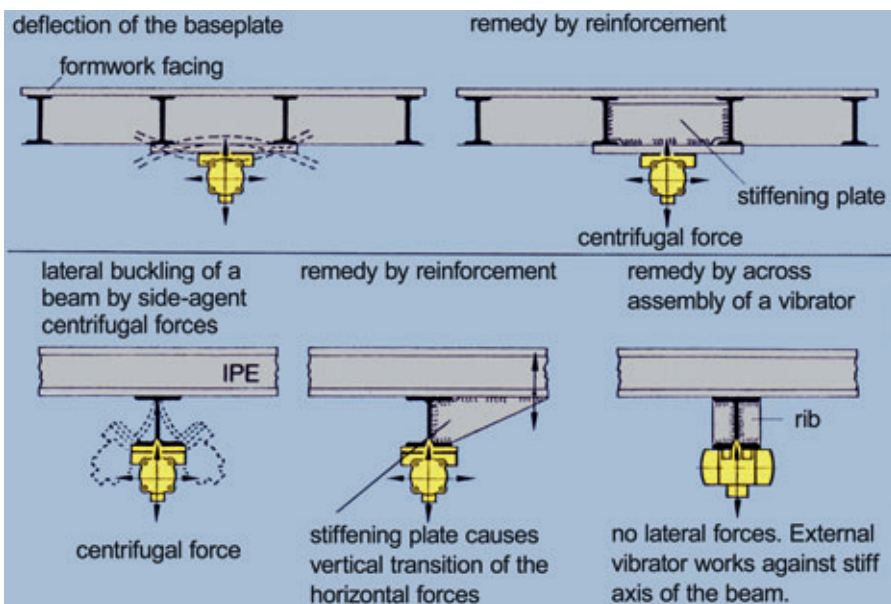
Possible structural stiffening of the attachment locations of external vibrators
